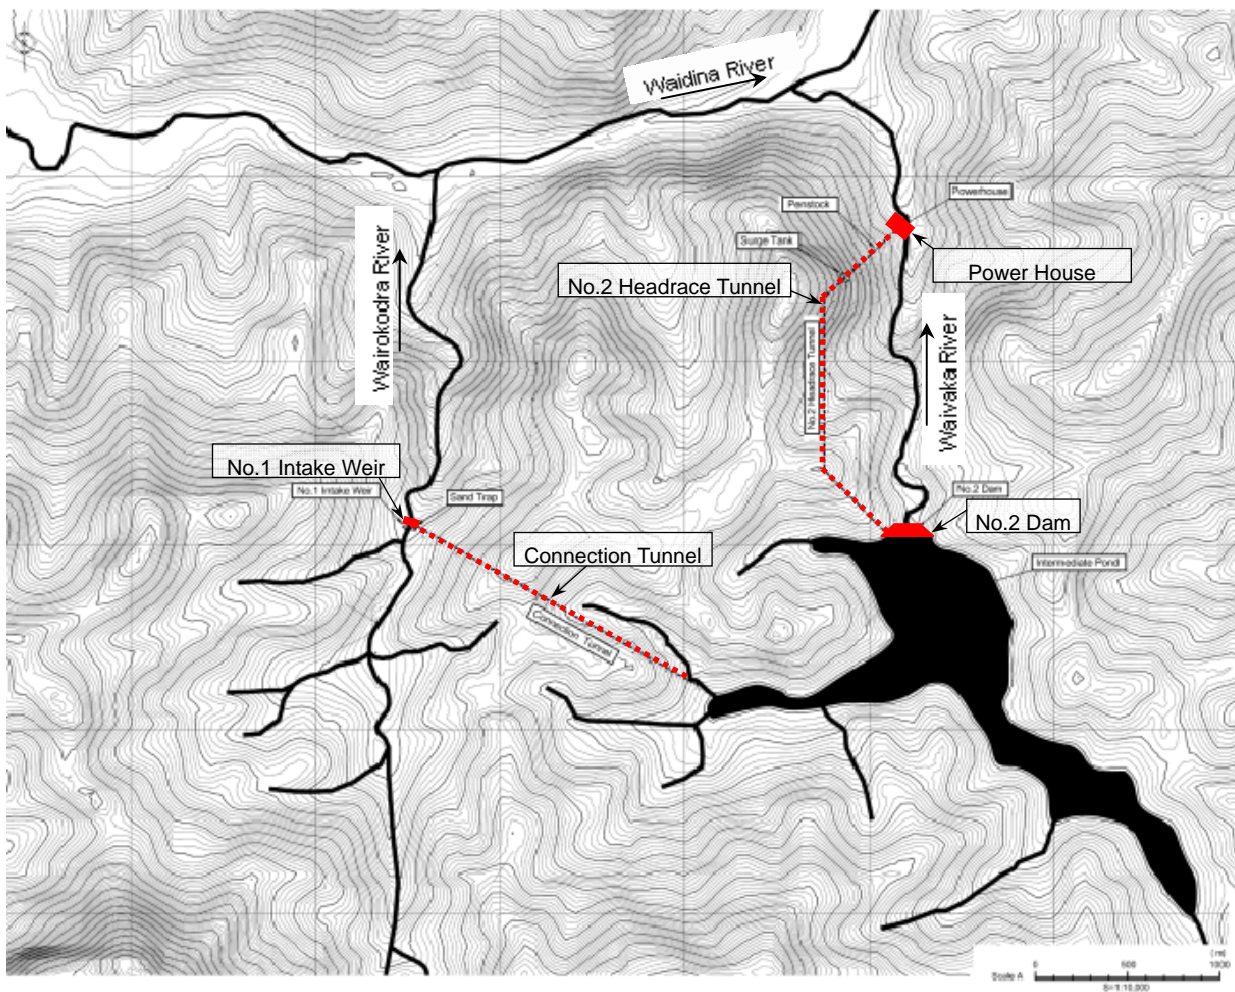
General Layout Plan for No.29 Waivaka Hydropower Scheme
